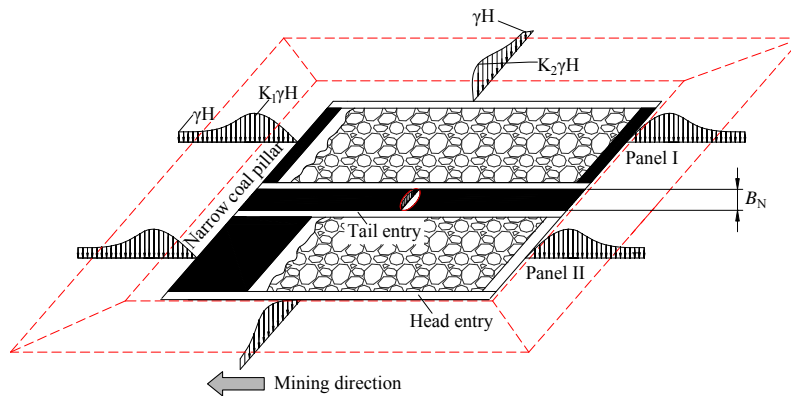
Plane layout of the narrow coal pillar mining pattern.
